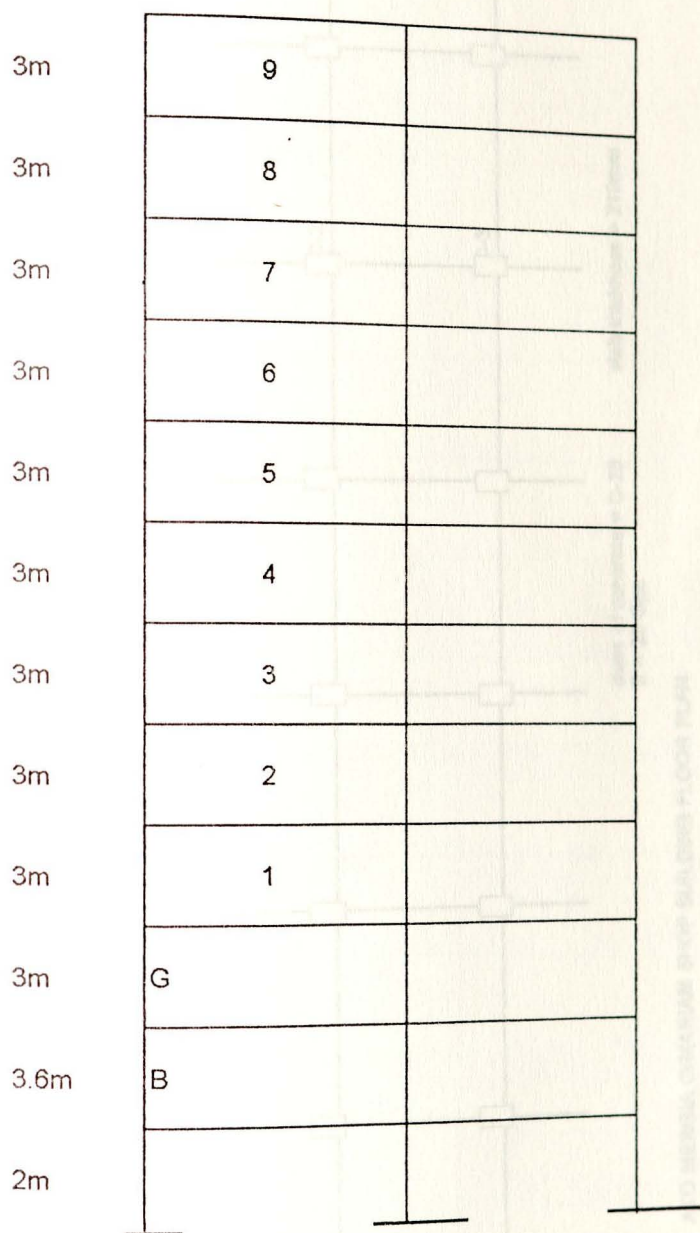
SCIENCE & TECHNOLOGY COMMISSION BUILDING ELEVATION.
